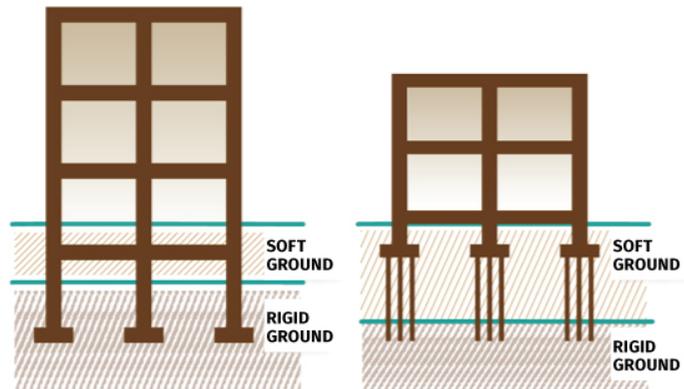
(a) Shallow foundations and (b) deep foundations (UNDRR/CAF)
